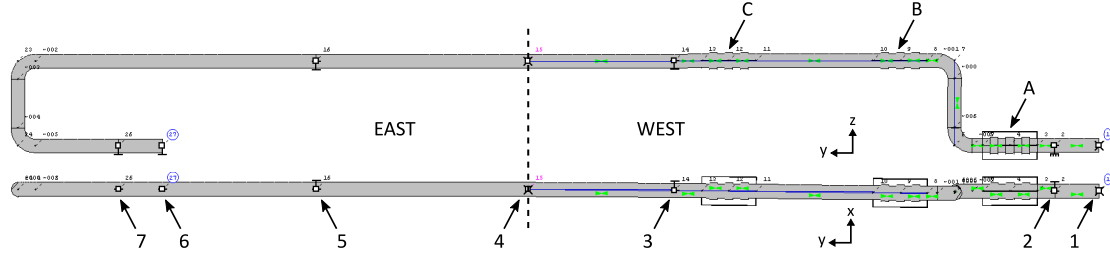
Top and side view of *Traverse_100* base model. A, B and C: compensators west-outer (gimbal hinged), west-center and west-inner (both single hinged). 1 and 4 are fix bearings. 2,3,5,6 and 7 are floating bearings.
